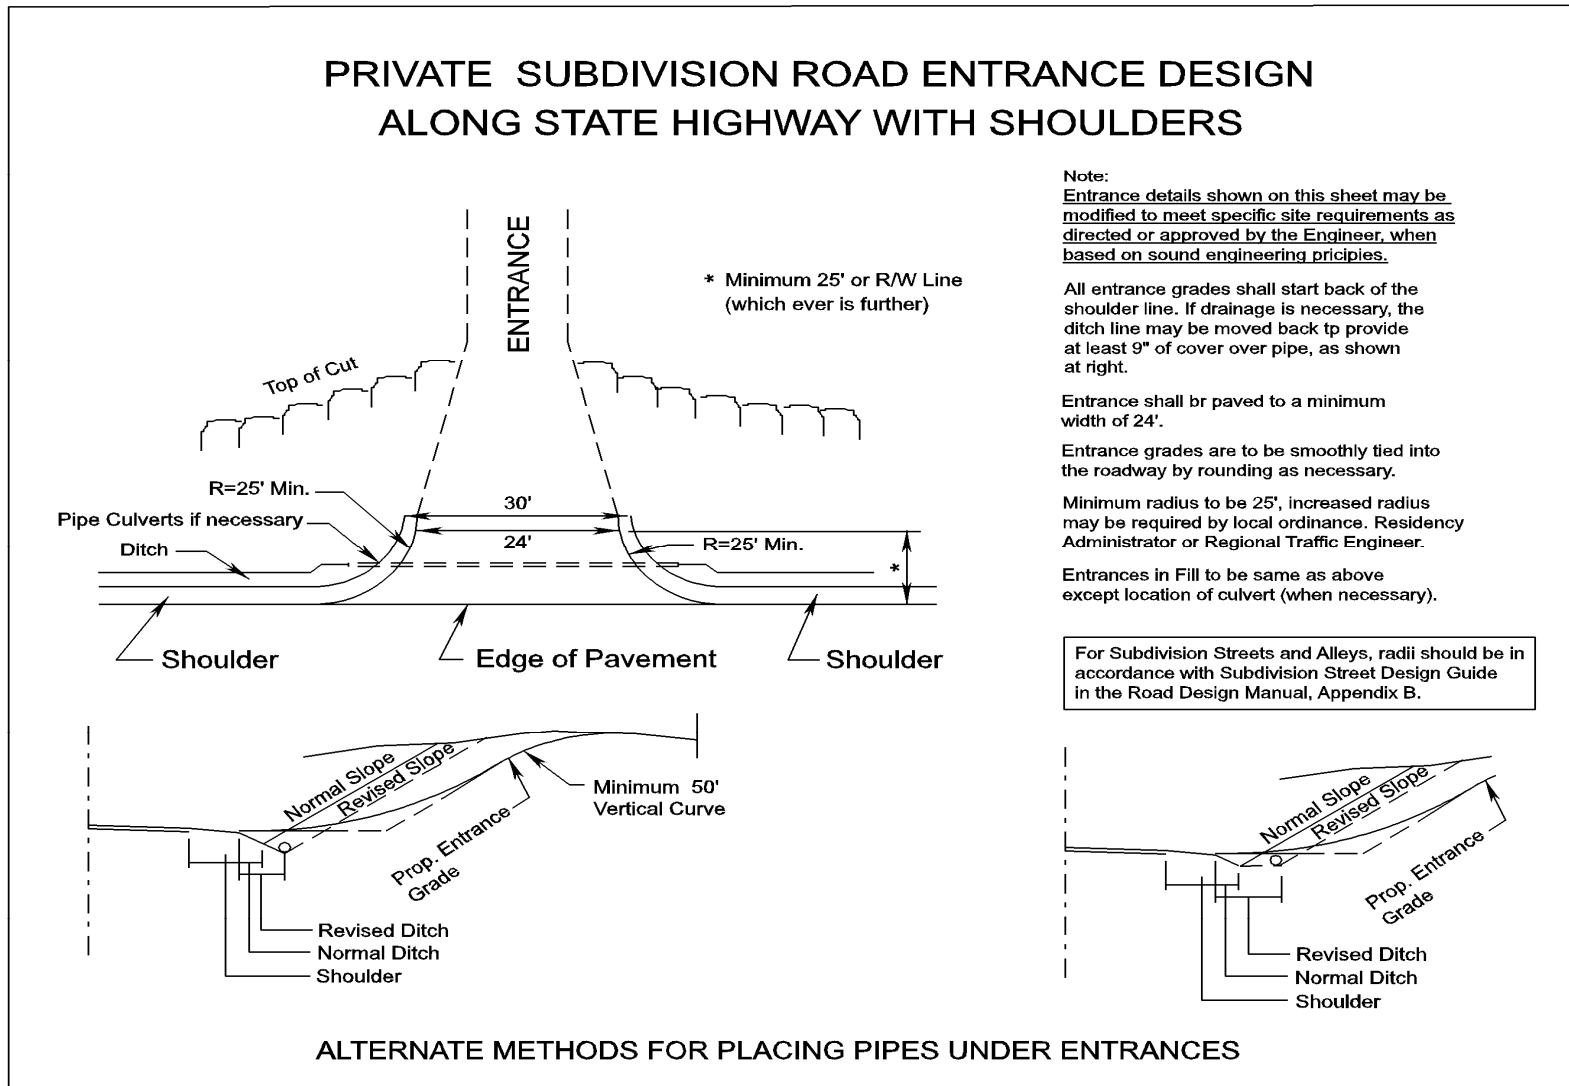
8 COMMERCIAL ENTRANCE DESIGN TO SERVE A PRIVATE SUBDIVISION ROAD / STREET
